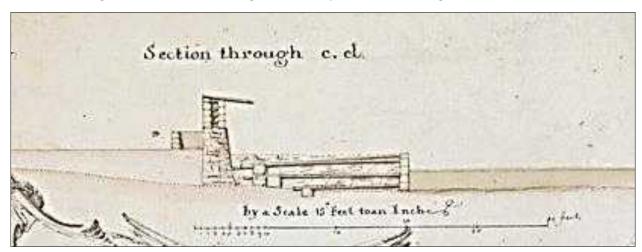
Detail of Plan of Fort Erie, *Built under the Direction of John Montressor*, *Engineer*, *1764*. By Francis Pfister, 1766 showing lakeside masonry wall and crib construction for pier and decking.
